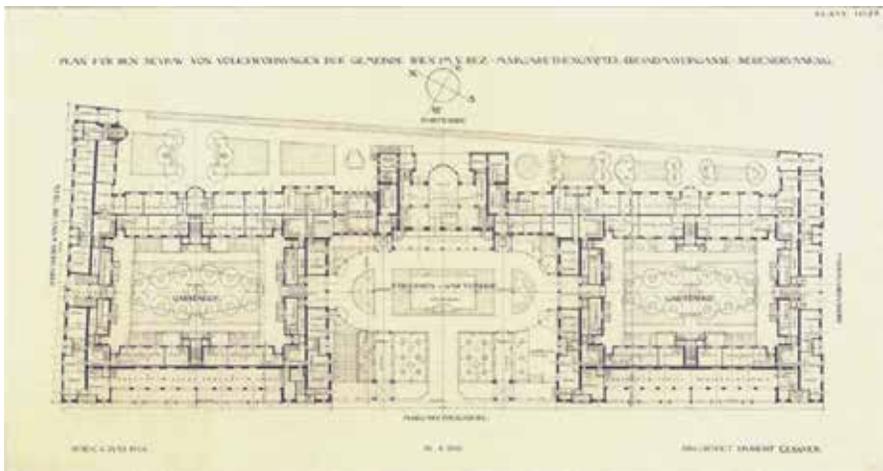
Reumann-Hof Floor Plan, (Zednicek, 2009)
